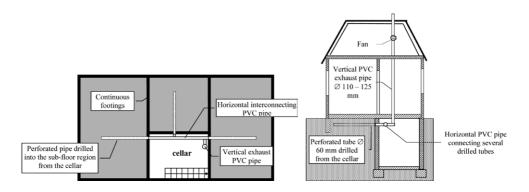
Sub-slab depressurization with perforated pipes drilled through the basement wall (Jiránek 2003).
